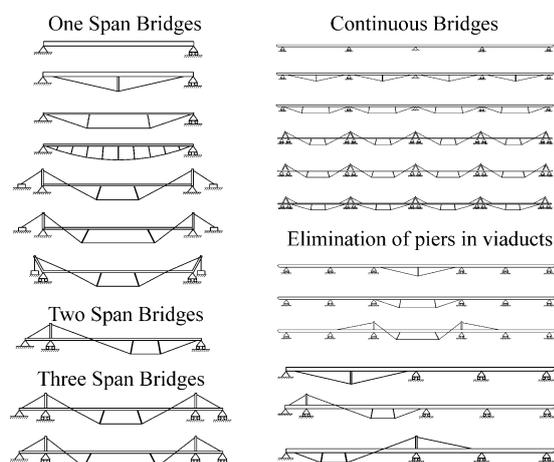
Different schemes of under-deck and combined cable-stayed bridges studied by the authors
